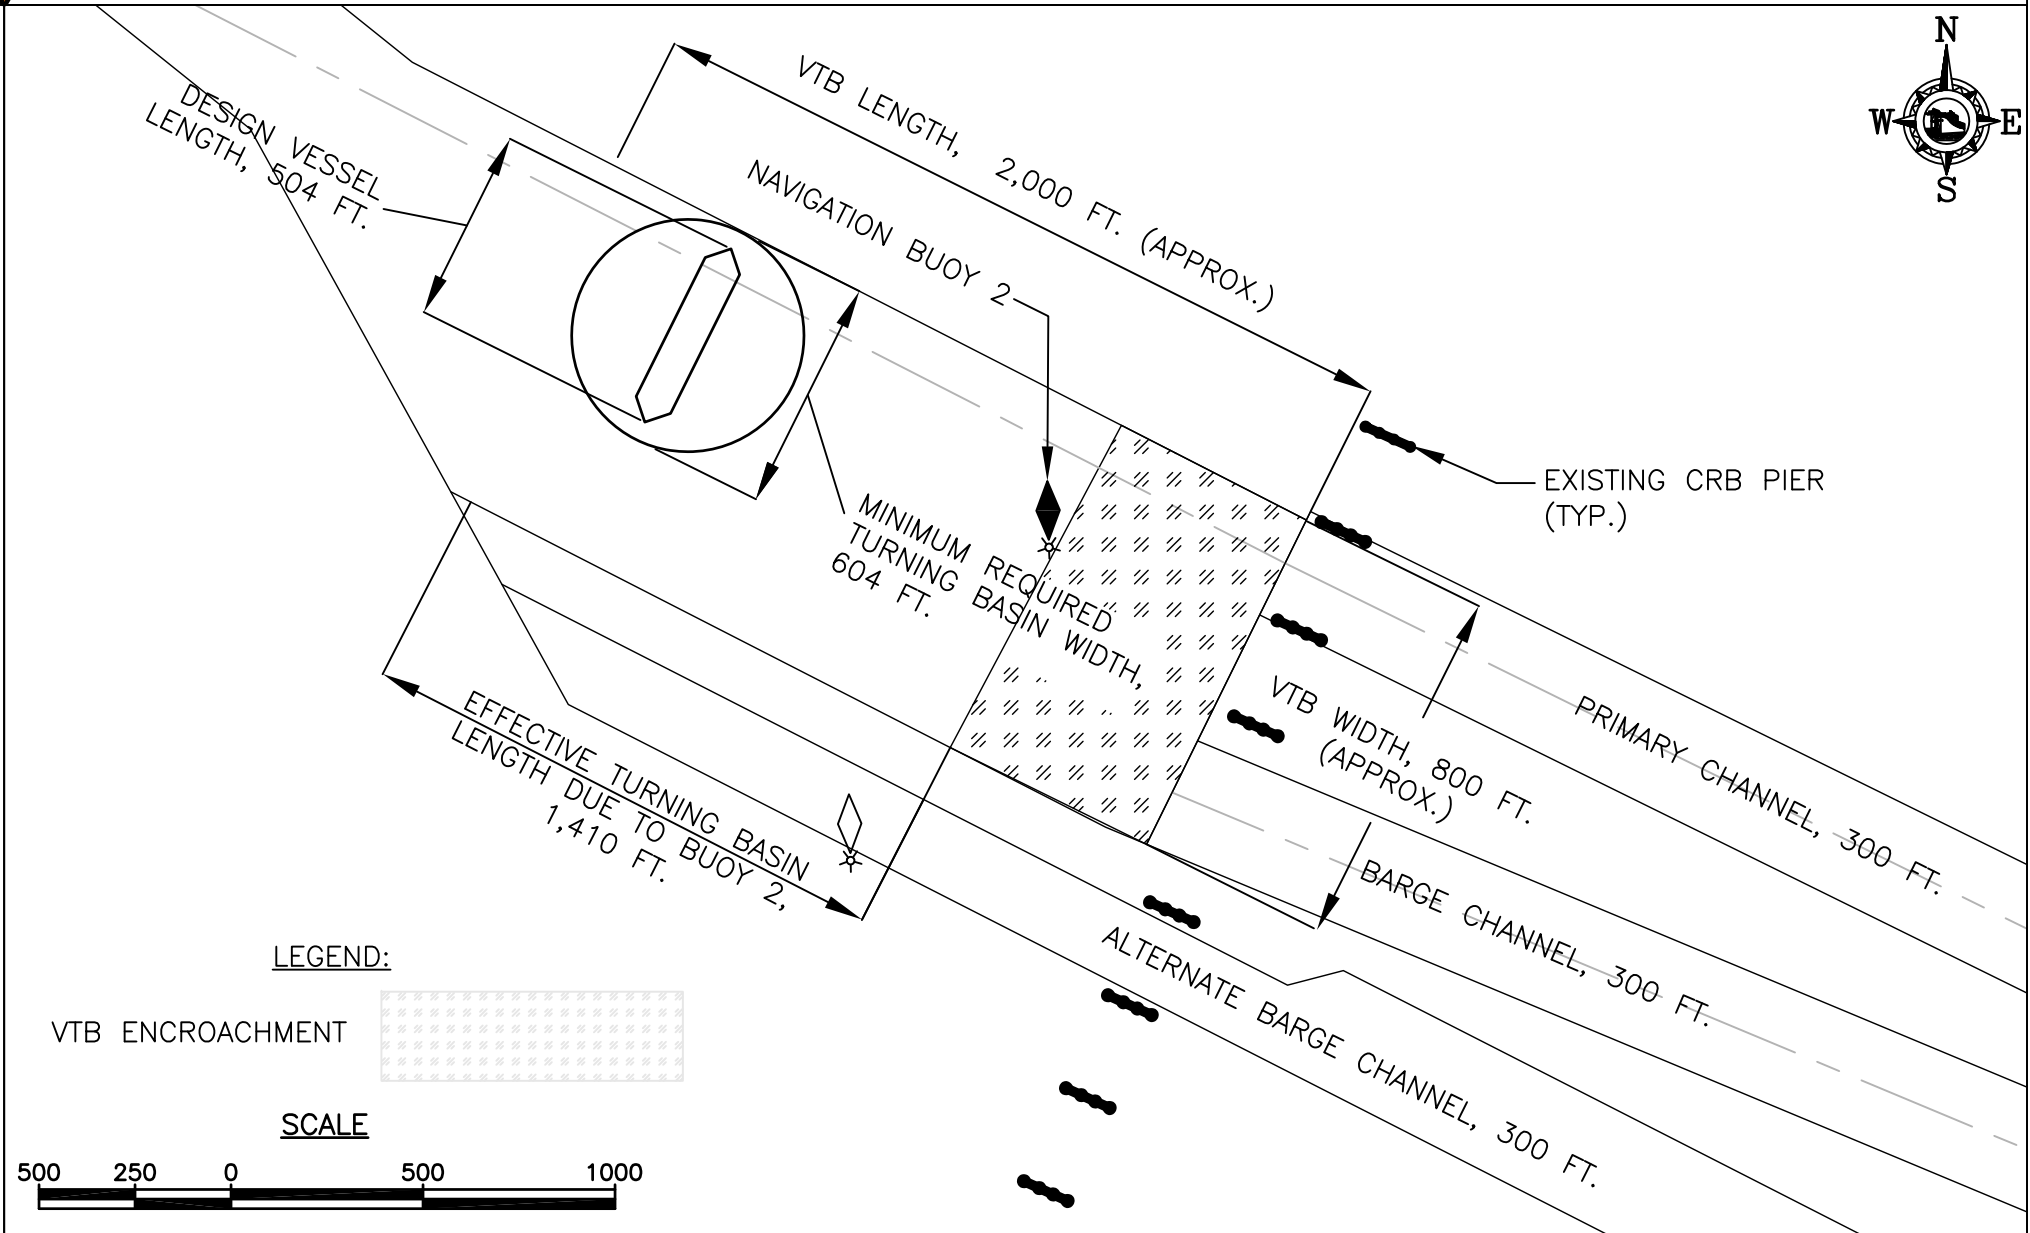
HIGH CURRENT LAYOUT BASED UPON USACE DESIGN CRITERIA (EXISTING I-5 BRIDGE)
